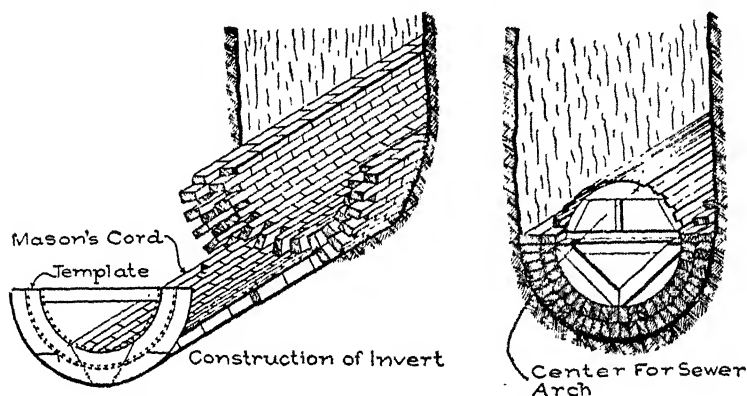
Diagrams Showing Construction of Brick Sewer.
